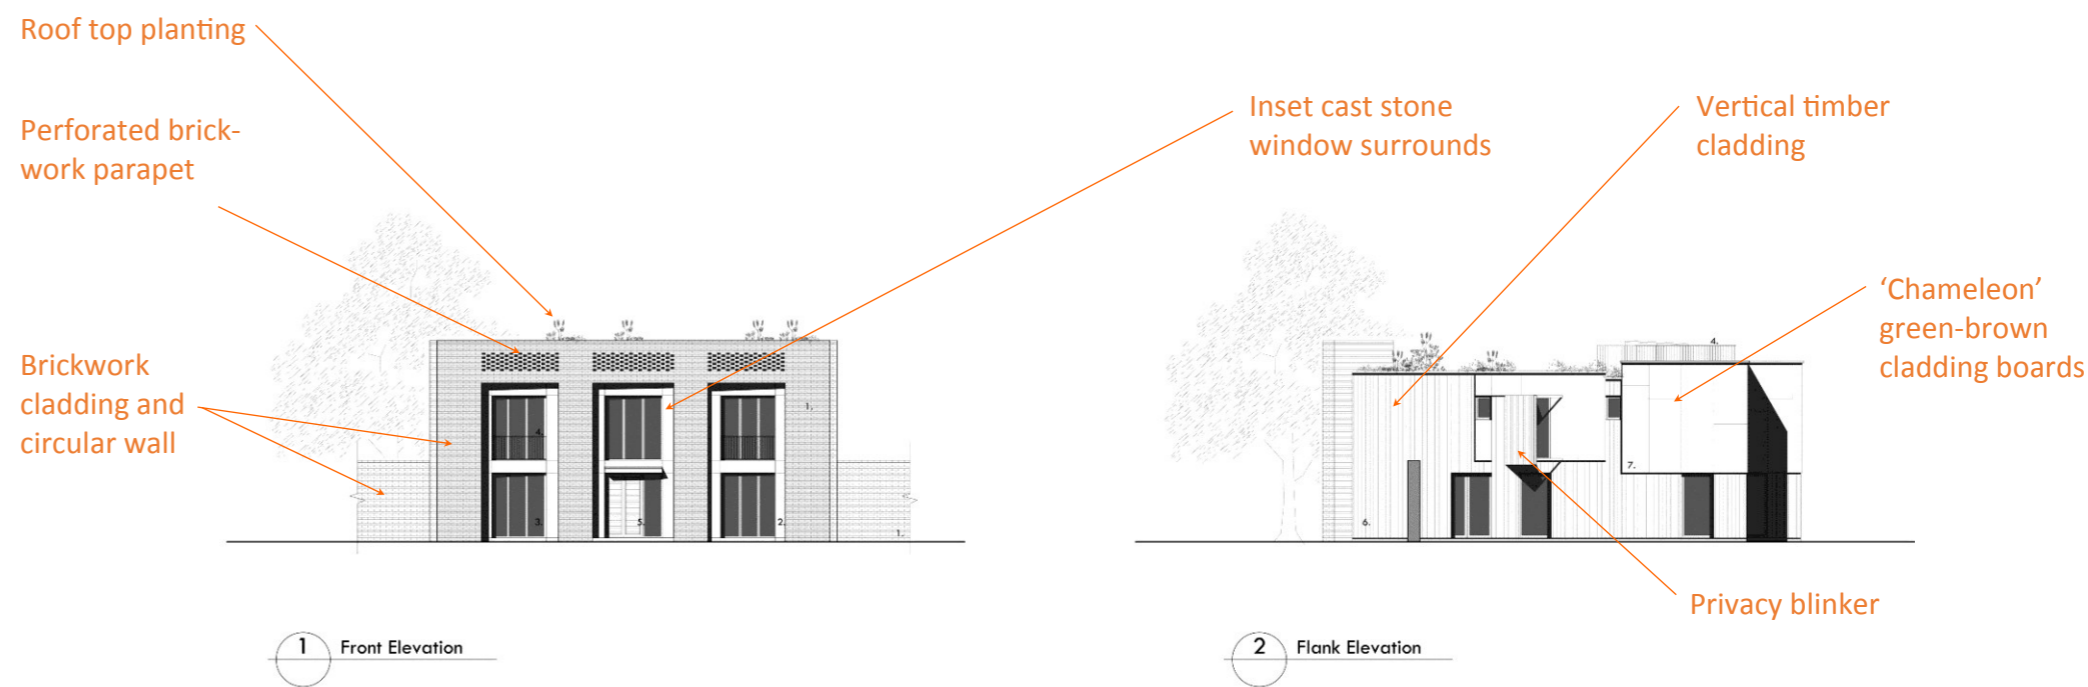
Proposed dwelling elevation (nts); refer to drawing 2150/120
